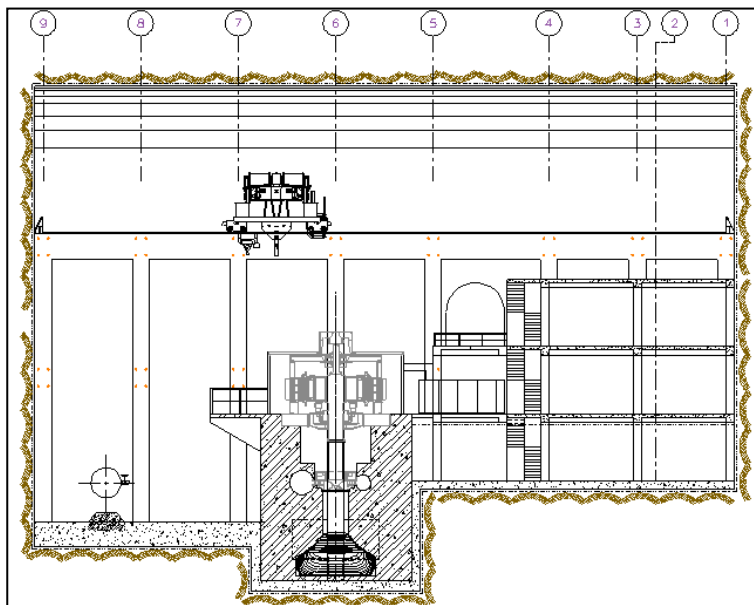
transversal section powerhouse [F.3], eco-flow works.
